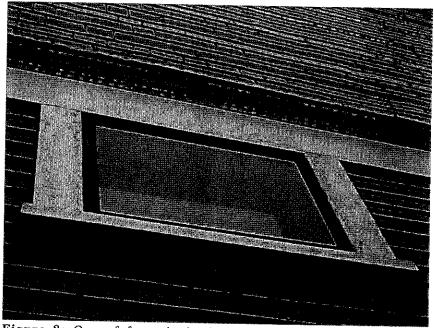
One of four single-lite casement windows on the north elevation. These windows will be replaced in kind.
